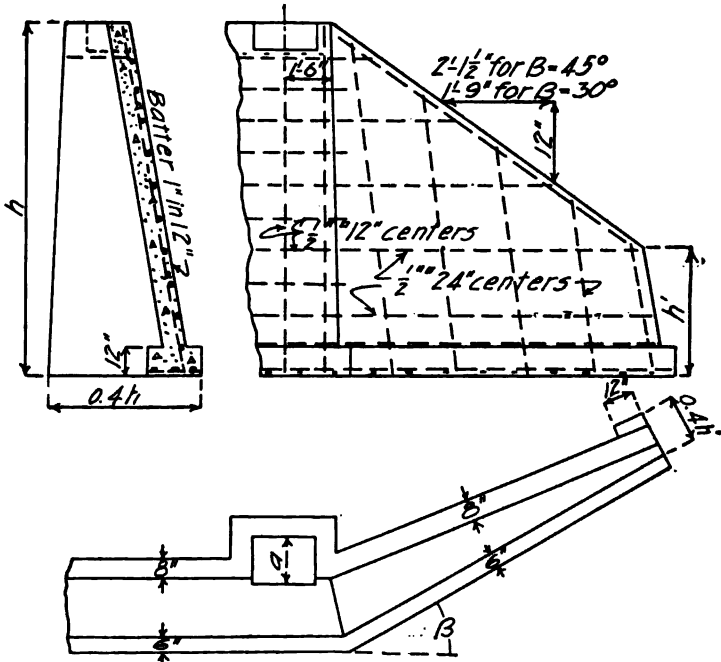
Detail of Abutment with Counterforts and Curtain Wall.
